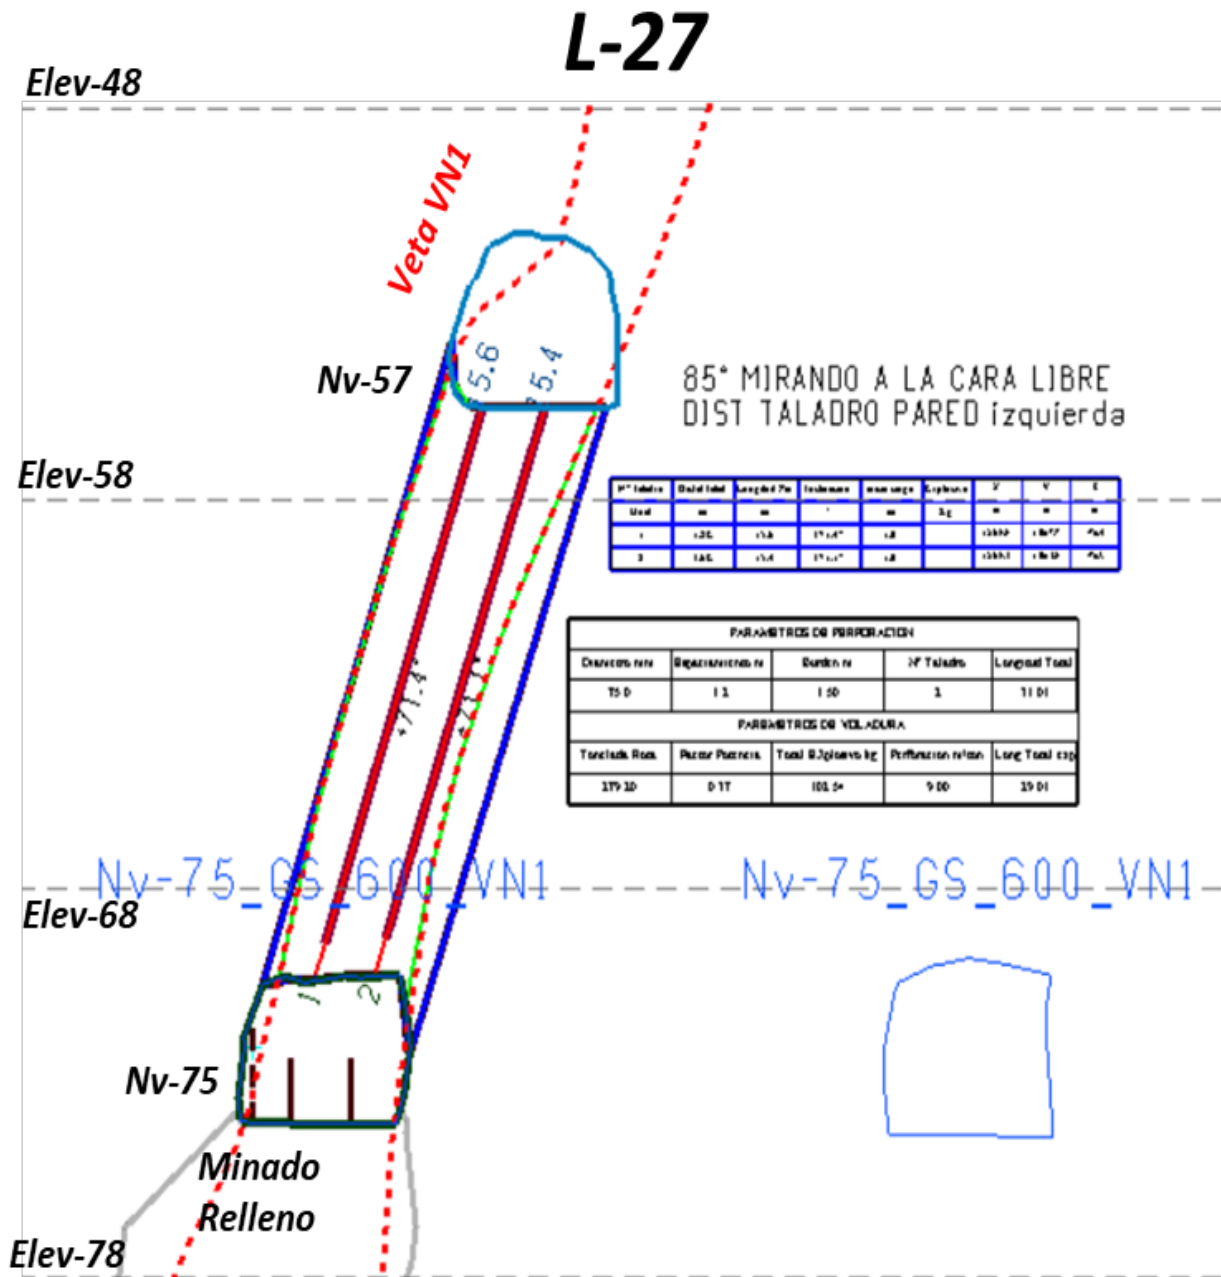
Typical Layout for Longhole Drilling Veta Nueva - Section
